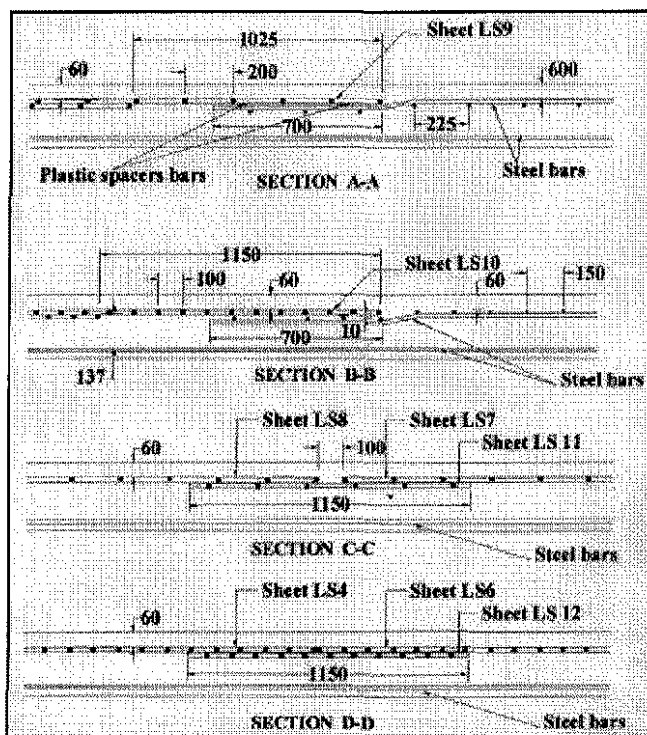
Structural details of bridge deck — cross section for CFRP grid reinforced concrete deck slab
